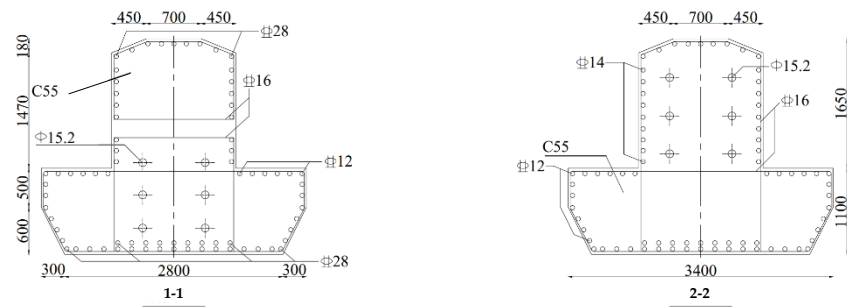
Cross-sectional details of the cap beam at the end (Section 1-1) and mid (Section 2-2) spans
